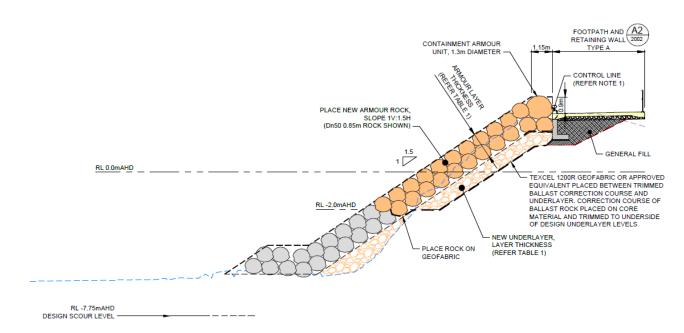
Detail of the southern breakwall remediation works "full reconstruction" of the breakwall.
